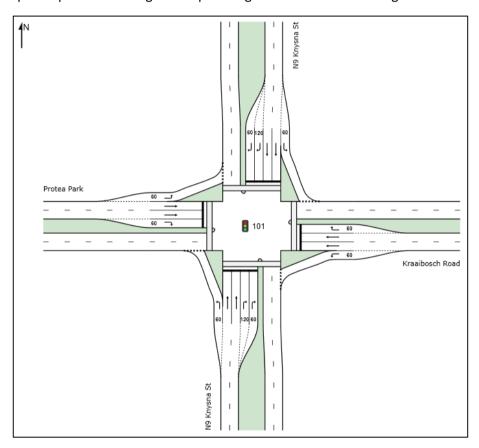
Layout: N9 Knysna Street & Kraaibosch Road
